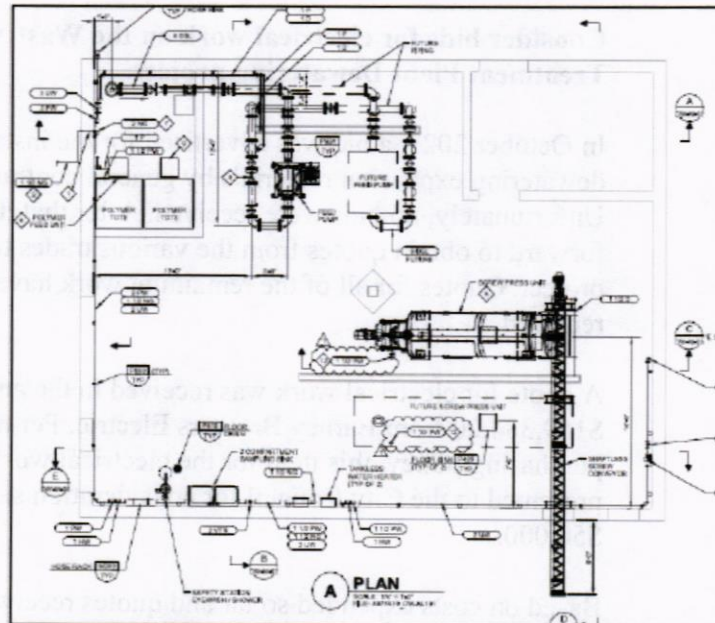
Plan view of existing Dewatering Building showing installed equipment and room for an additional train of dewatering equipment.
